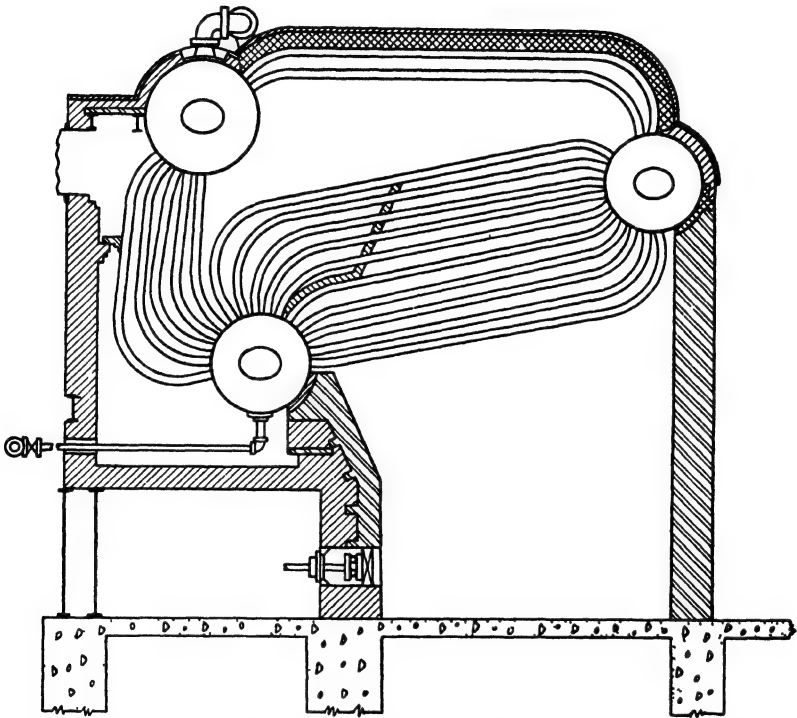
Bent-tube type of boiler (Courtesy of Webster Engineering Company)
